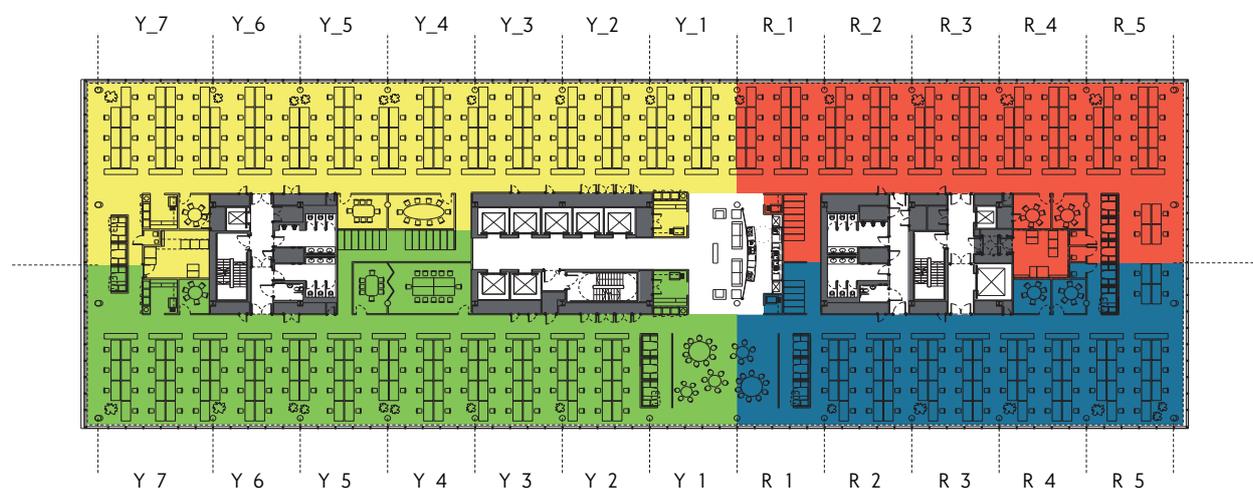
TfL Palestra, Floor plan divided into colour coded quarters.
